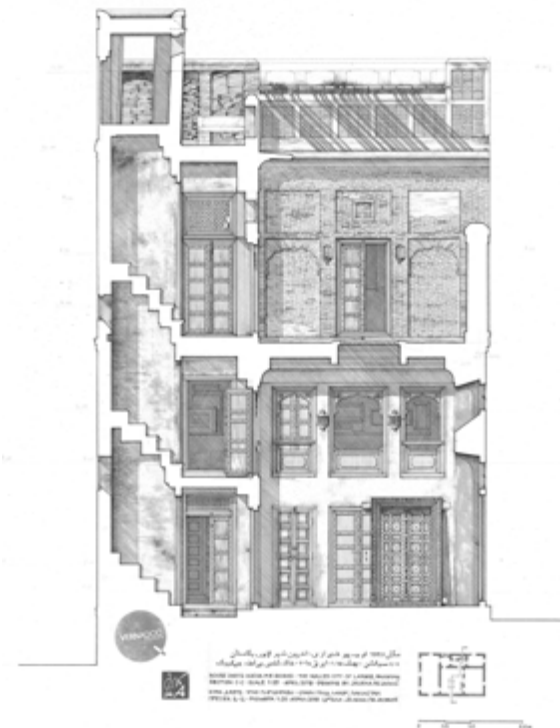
Section of House D3372 – Kucha Pir Shirazi, the Walled City of Lahore, Pakistan. Original scale 1:25 (Drawing by J. Pejkoć) ©The author
